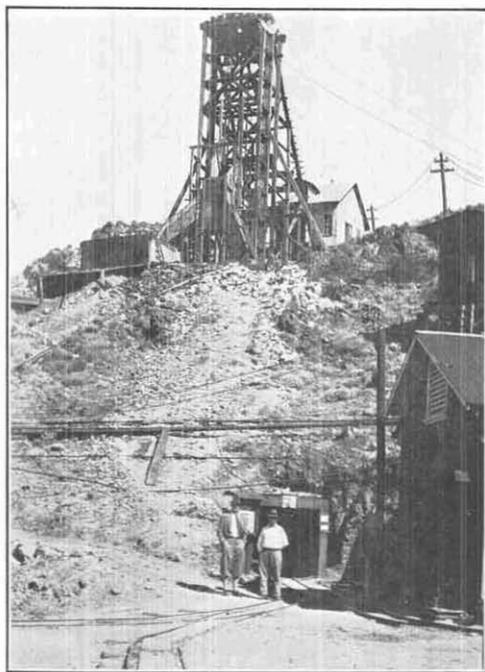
Headframe at a vertical shaft, Oatman, Ariz., showing short adit connecting surface plant with shaft
